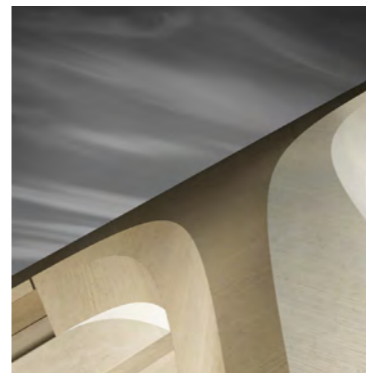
Concept of sculptural shaped forms applied to bridge pier
